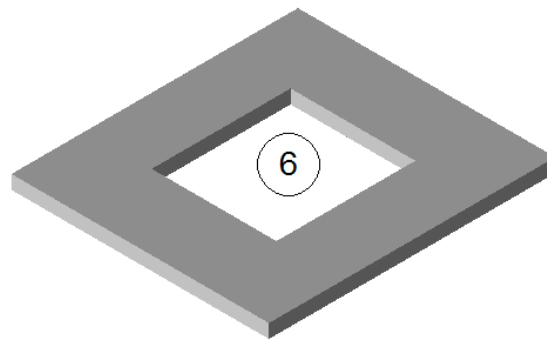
Supporting Construction – Concrete Floor/Ceiling
